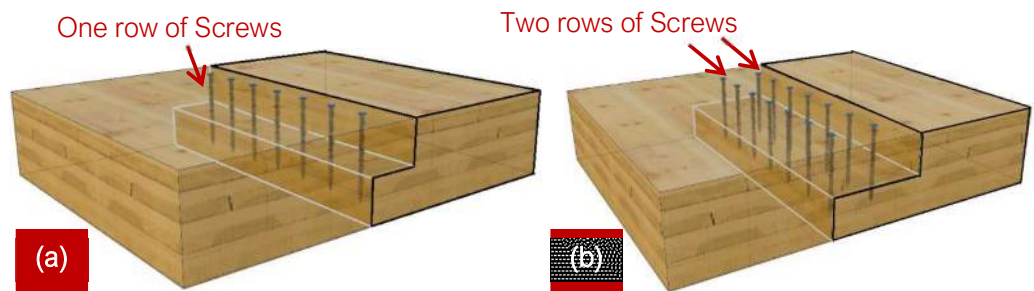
CLT floor to floor connection; a) Lap joint; b) Wider lap joint with two rows of screws.
